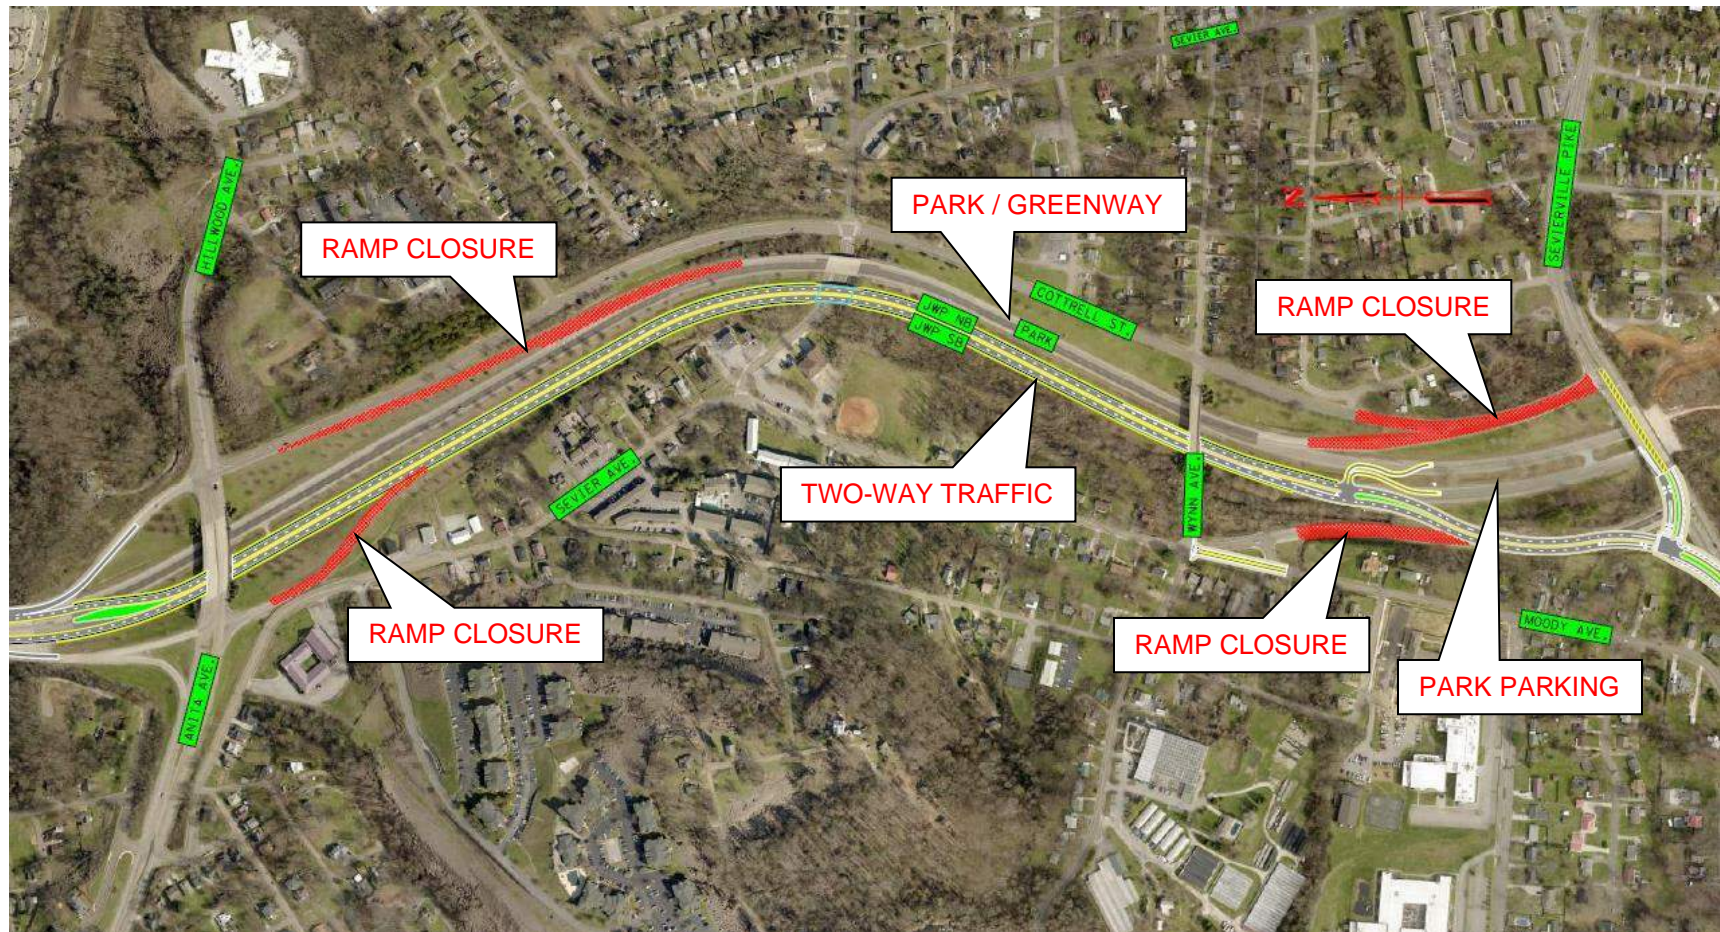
BUILD ALTERNATIVE SINGLE-LINE SKETCH
